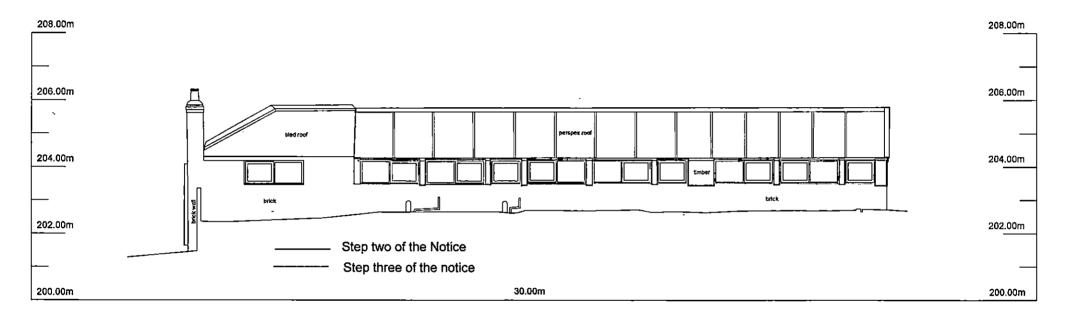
attached to the Order made in respect of Claim E30LS233 - ELEVATION B-B
